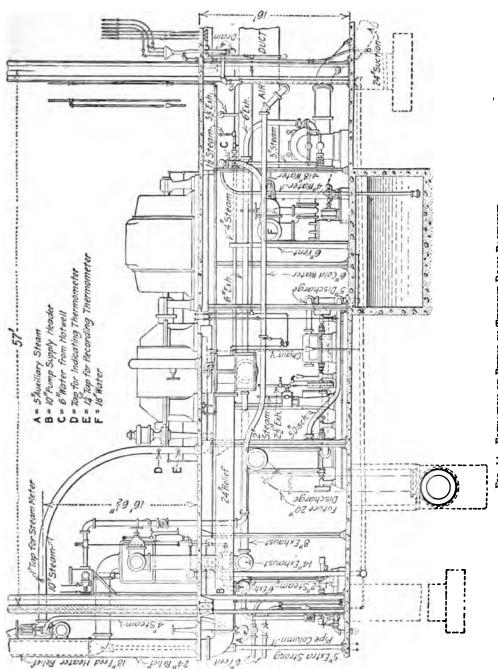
ELEVATION OF PIPING IN TURBINE-ROOM BASEMENT.
